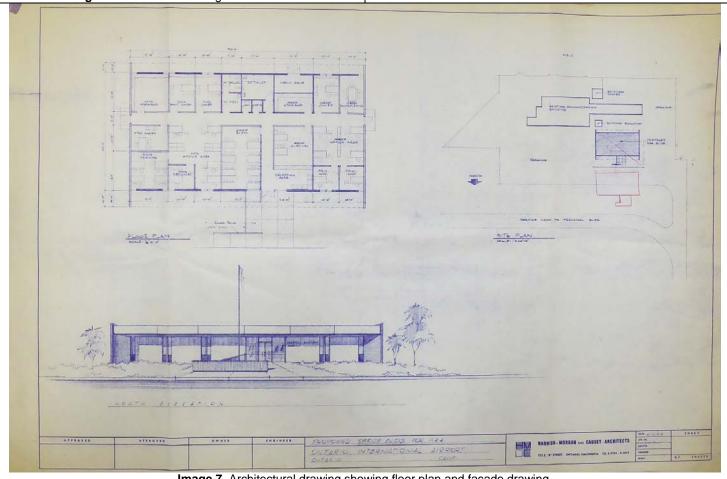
Architectural drawing showing floor plan and façade drawing. [architectural drawing dated 1965, Ontario International Airport Authority records]
